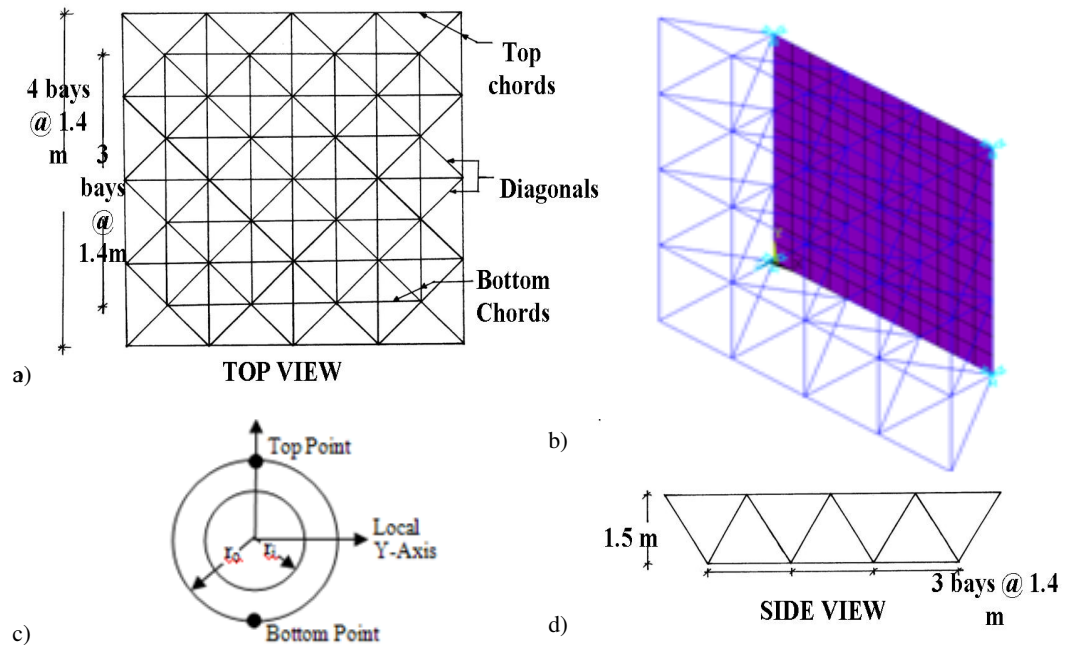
Single panel structure. a) Top view; b) 3-D view; c) Frame member cross-section with top and bottom of cross section marked; and d) Side view.
